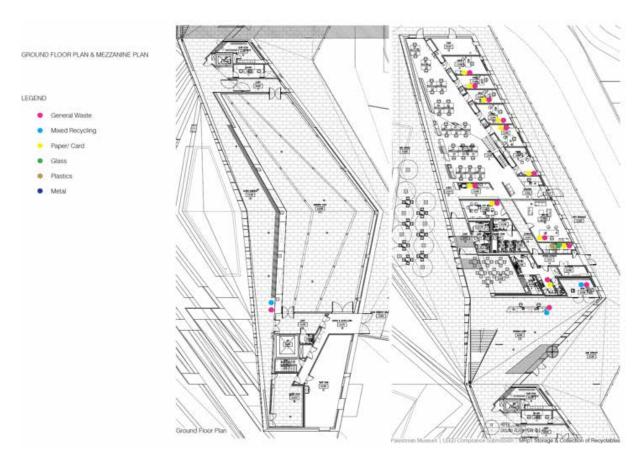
Ground Floor Plan and Mezzanine Plan – Waste Bins distribution
